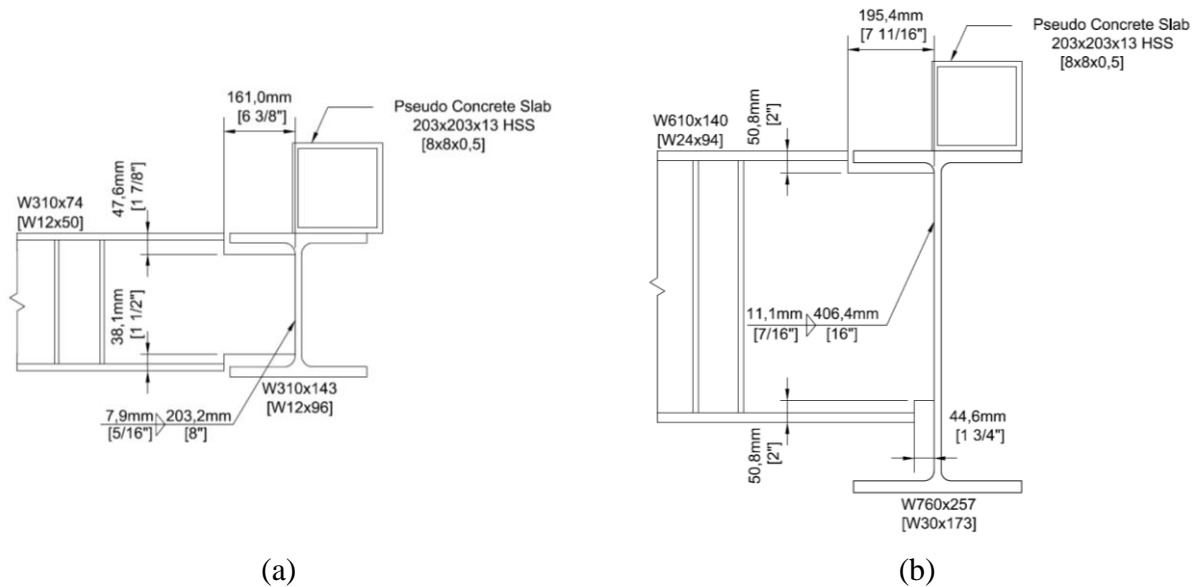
Coped beams welded in shop: (a) Specimen 8, (b) Specimen 10
